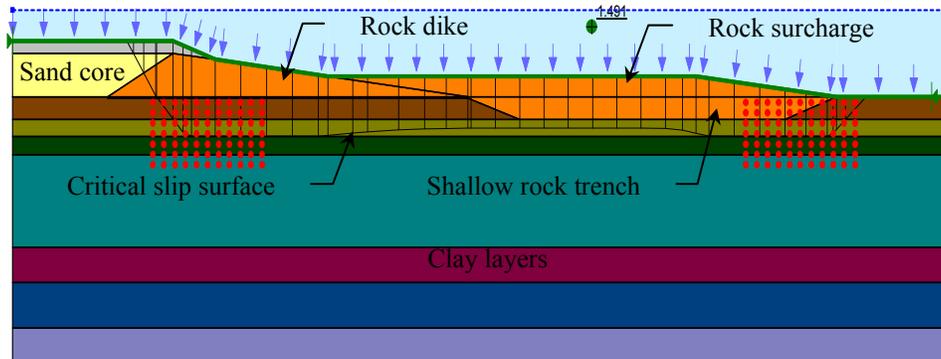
Slope/W stability analysis results for the shallow rock fill trench with the bottom at elevation of -53 feet
